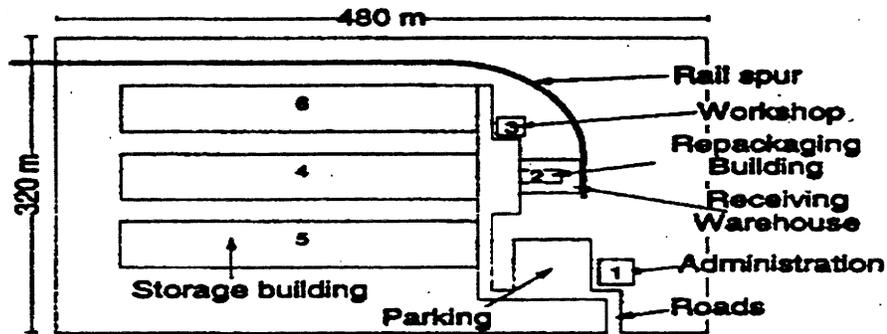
Site Layout UO₂ Building Storage Facility - 50% Capacity
